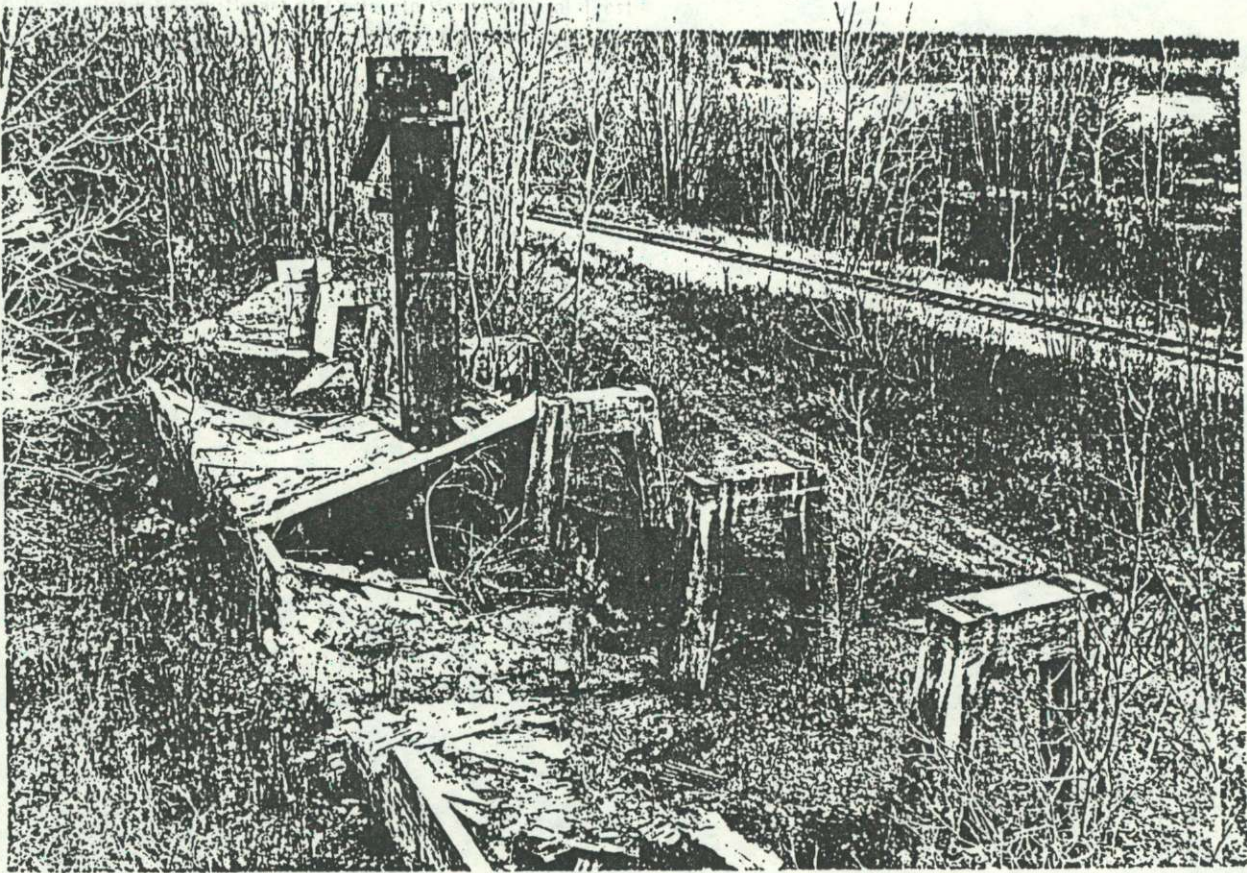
View to Southeast of Concrete Bents of Coal Trestle
